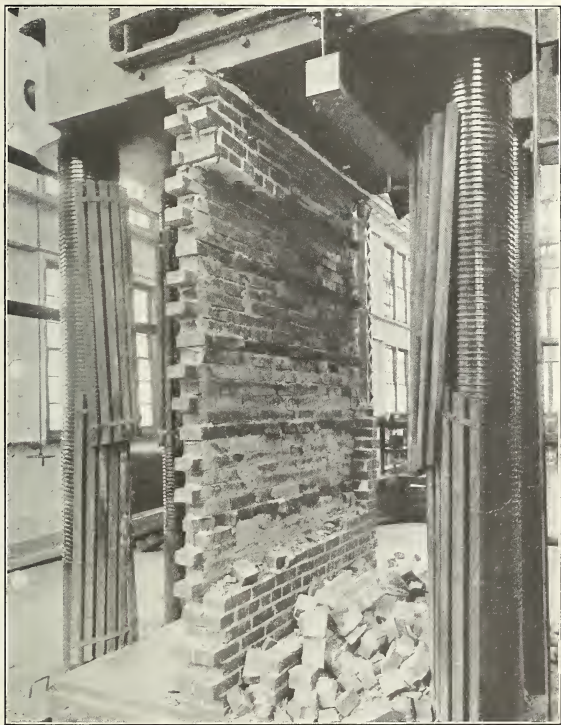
Compression test of 8-inch solid wall of brick. Note failure due to breakage of headers. Bureau of Standards, Washington, D. C.
